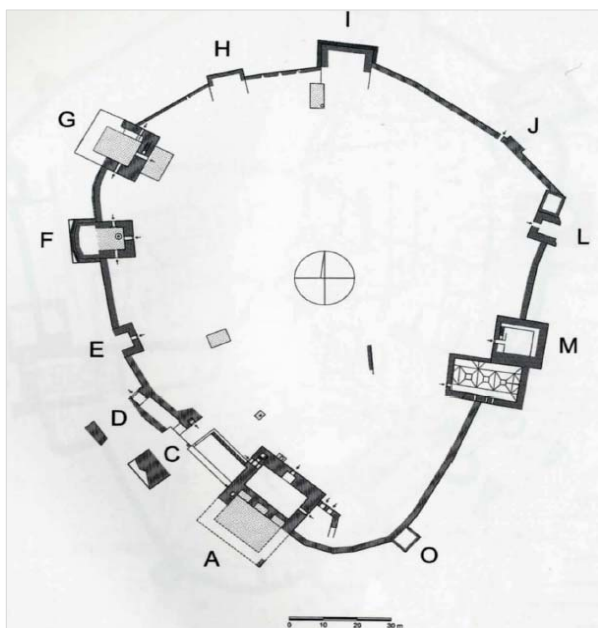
Plan of the castle. ⁽⁹⁶⁾
